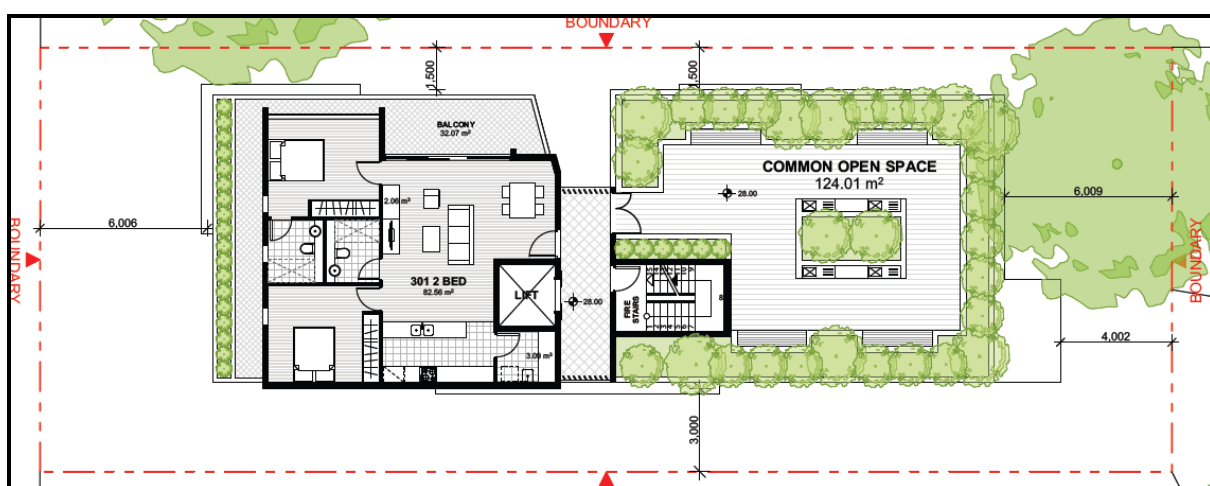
186 Moore Street top floor plan (proposal RFB to the east)
